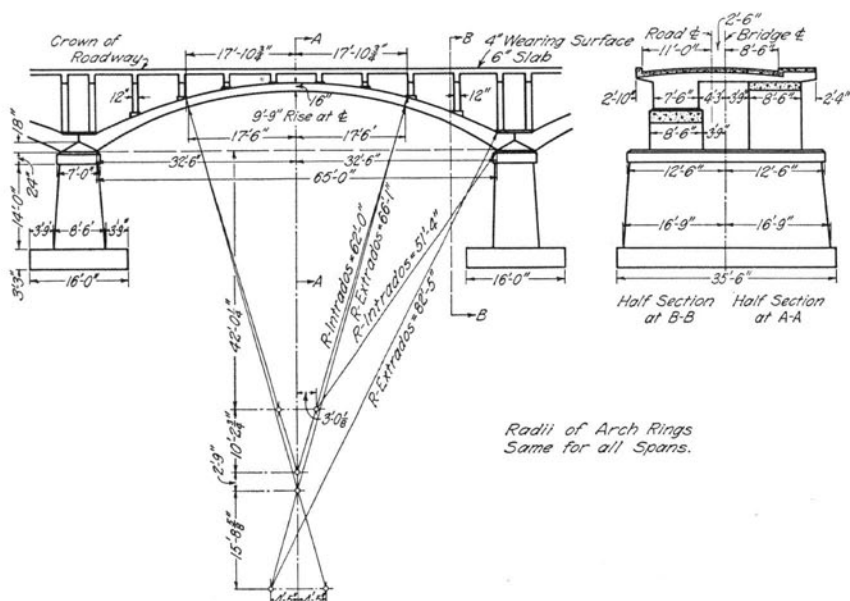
GENERAL DIMENSIONS, WASHINGTON STREET BRIDGE, ROCKTON, ILLINOIS
